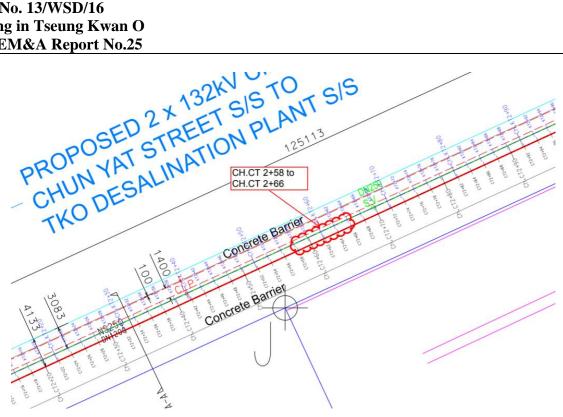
Location Plan for CH.CT 2+58 – 2+66
